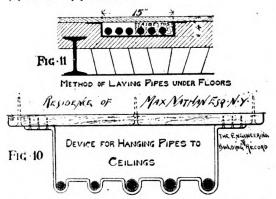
illustrates the manner of laying pipes under floors, and is utilized wherever pipes are laid under floors in the hall and dressing-room. A recess under floor is lined with sheet-lead in the form as shown in section, and is connected with waste-pipes that extend to cellar, and therefore if any leak in the pipe should occur the water will be removed without injury to ceiling below. The cold-water pipes are covered with asbestos mortar to prevent adjacent hot-water pipes from heating the cold water.
